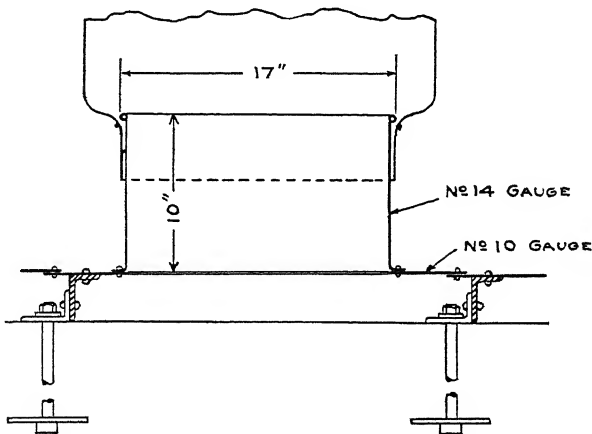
DETAIL OF THIMBLE CONSTRUCTION.
